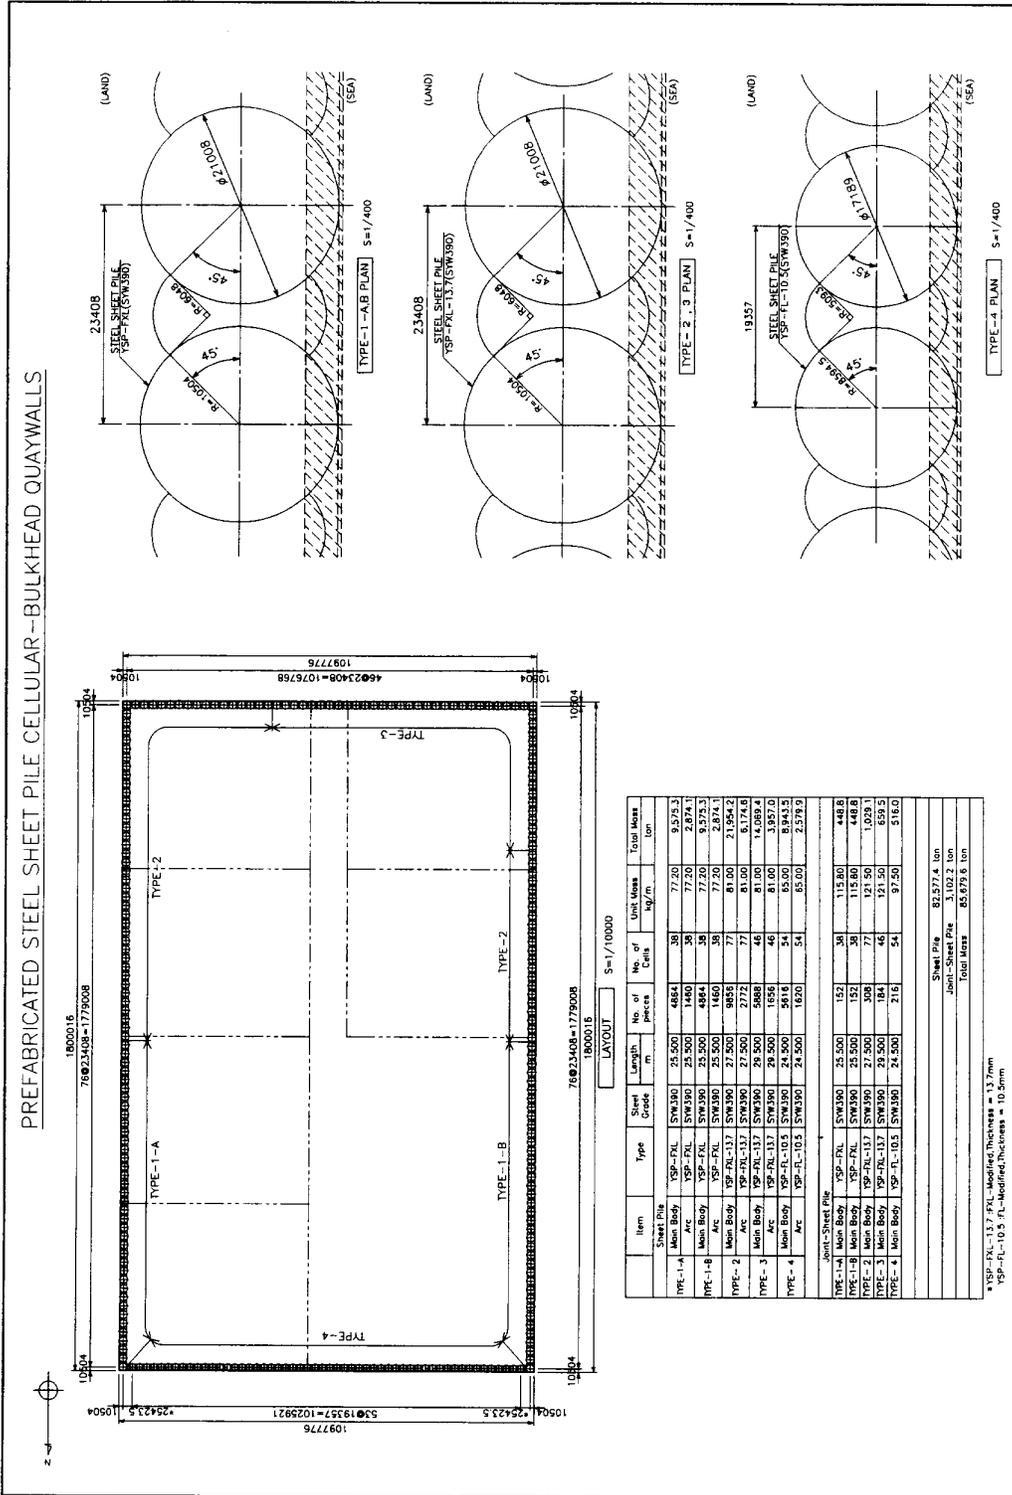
Plan of Steel Sheet Pile Cellular-bulkhead Quaywall
